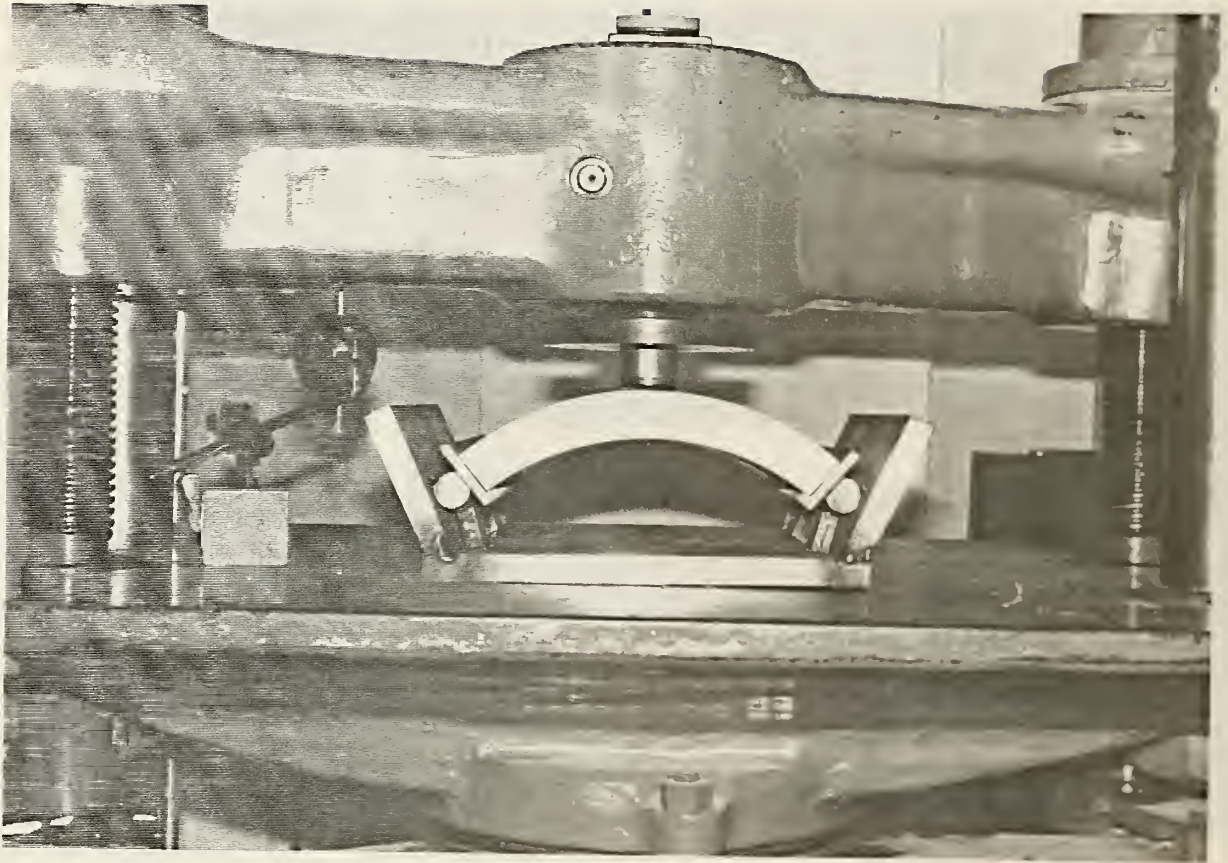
Test setup for the 1/25-scale shell specimens.
